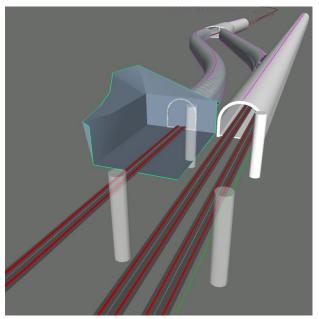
3D Rendering of the Tunnel Connections from TBM Bored Tunnel (upper left) to Existing Caltrain Tracks/Tunnel (right)
